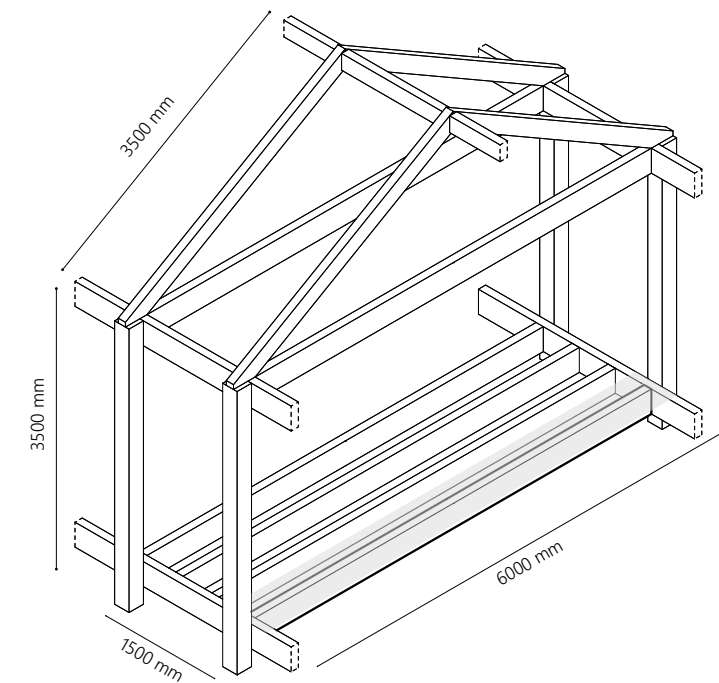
Axonometric drawing with load on the floor beam (Own work, 2024)
